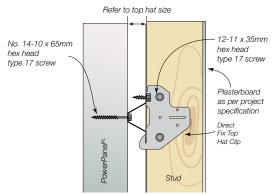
Hebel PowerPanel^{XL} Zero Boundary Wall System fixing detail (Achieves FRL 90/90/90 when installed as part of the wall system. See Section 2.2)
